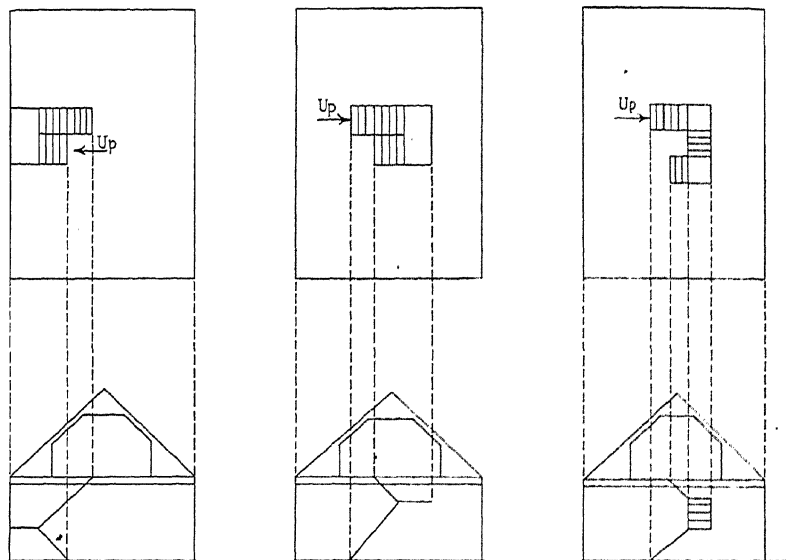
Stairways that may be used in a story-and-a-half house.
